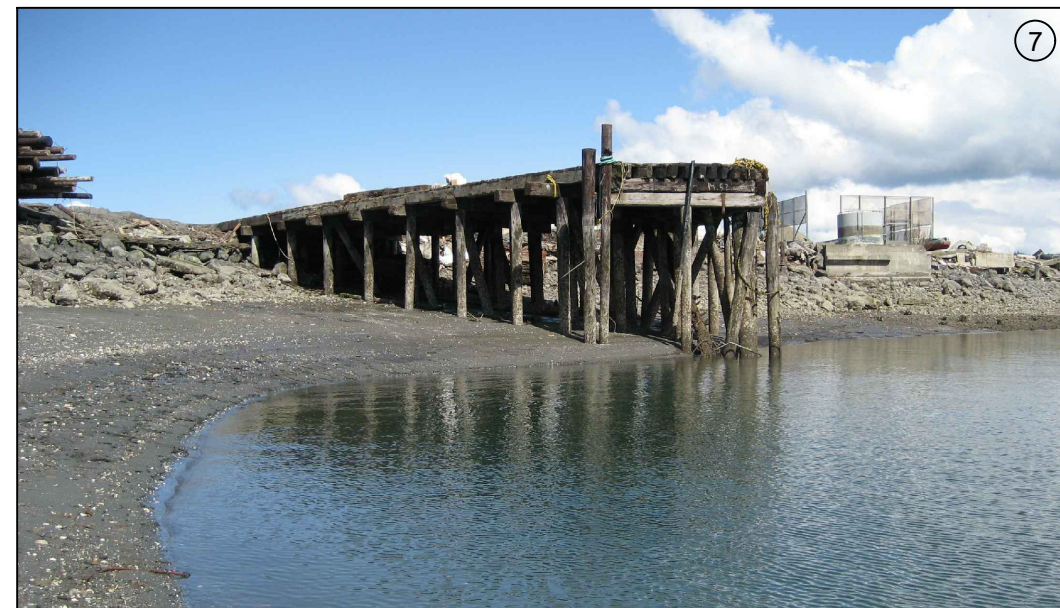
PIER 5 AND SHORELINE BULKHEADS
